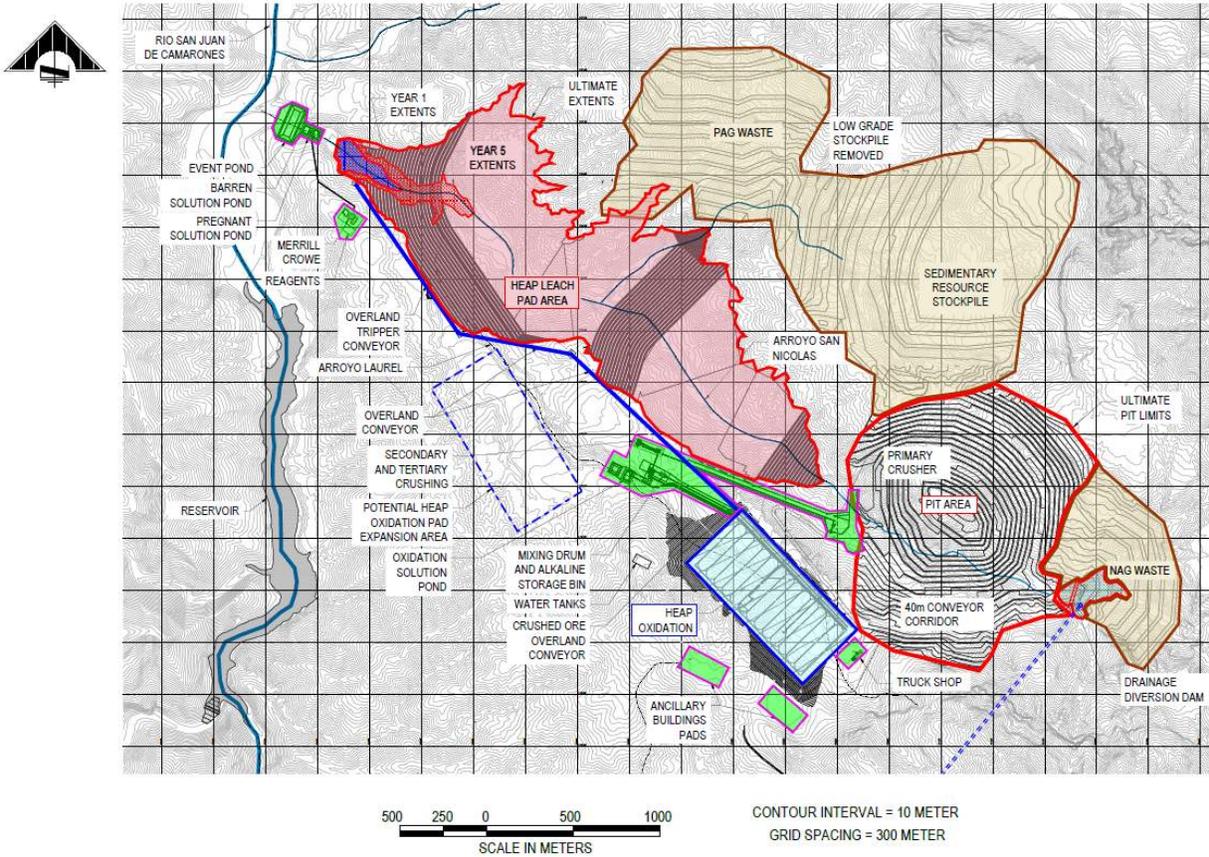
General Arrangement of Open Pit, Stockpile and Waste Rock Dumps and Process Facilities
